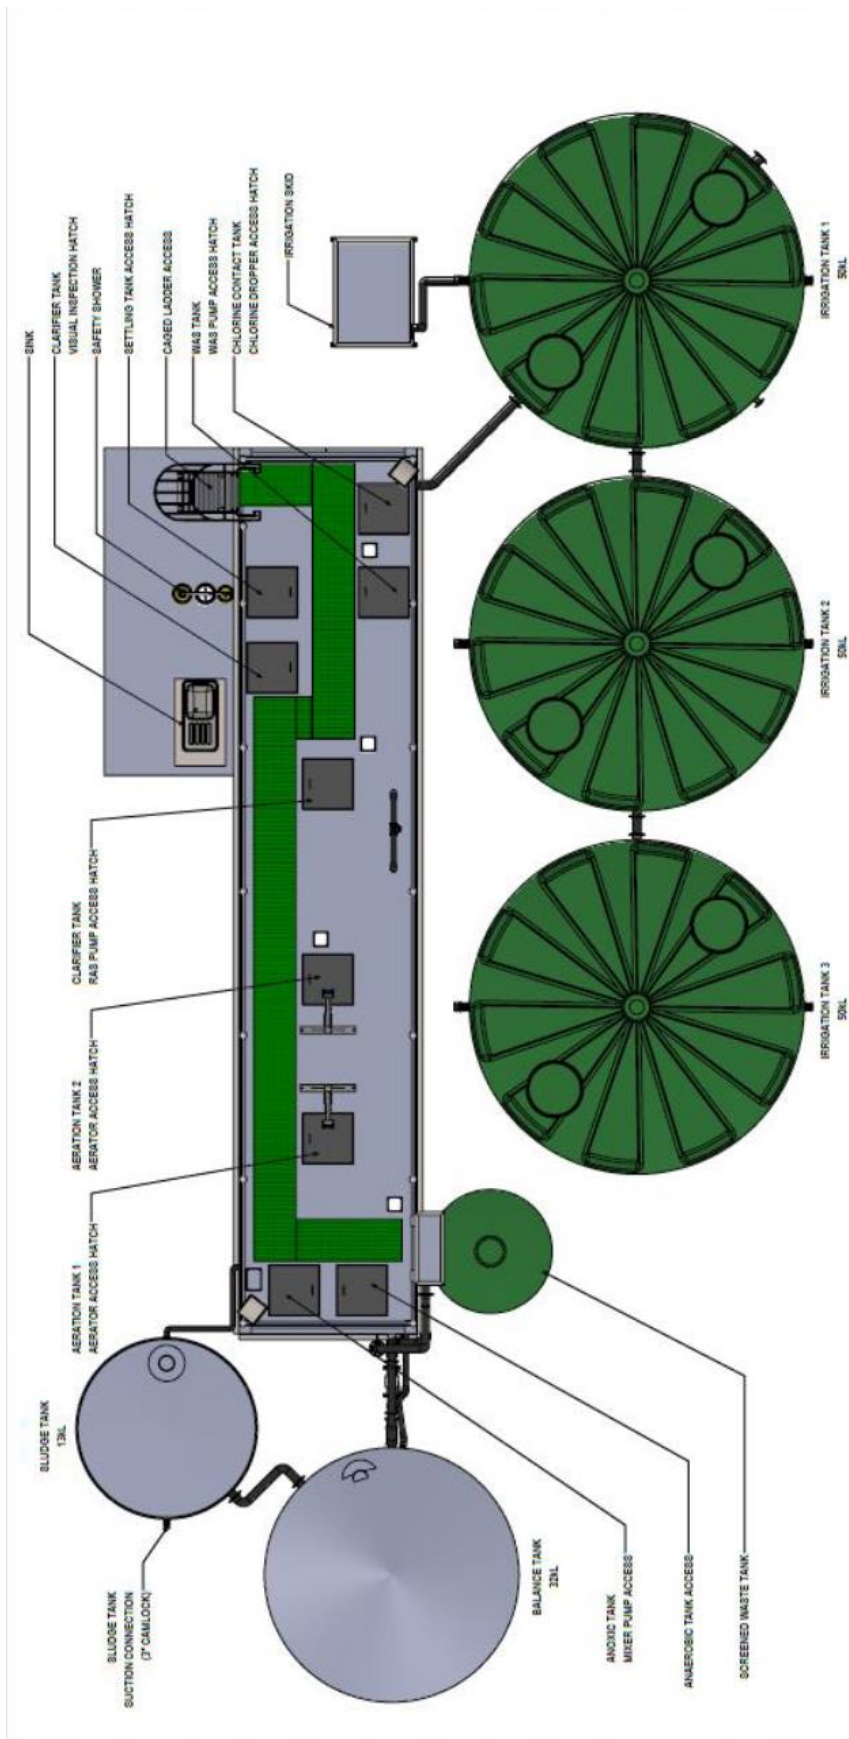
'As constructed' Wastewater treatment plant layout (Atlas, 2020e)
